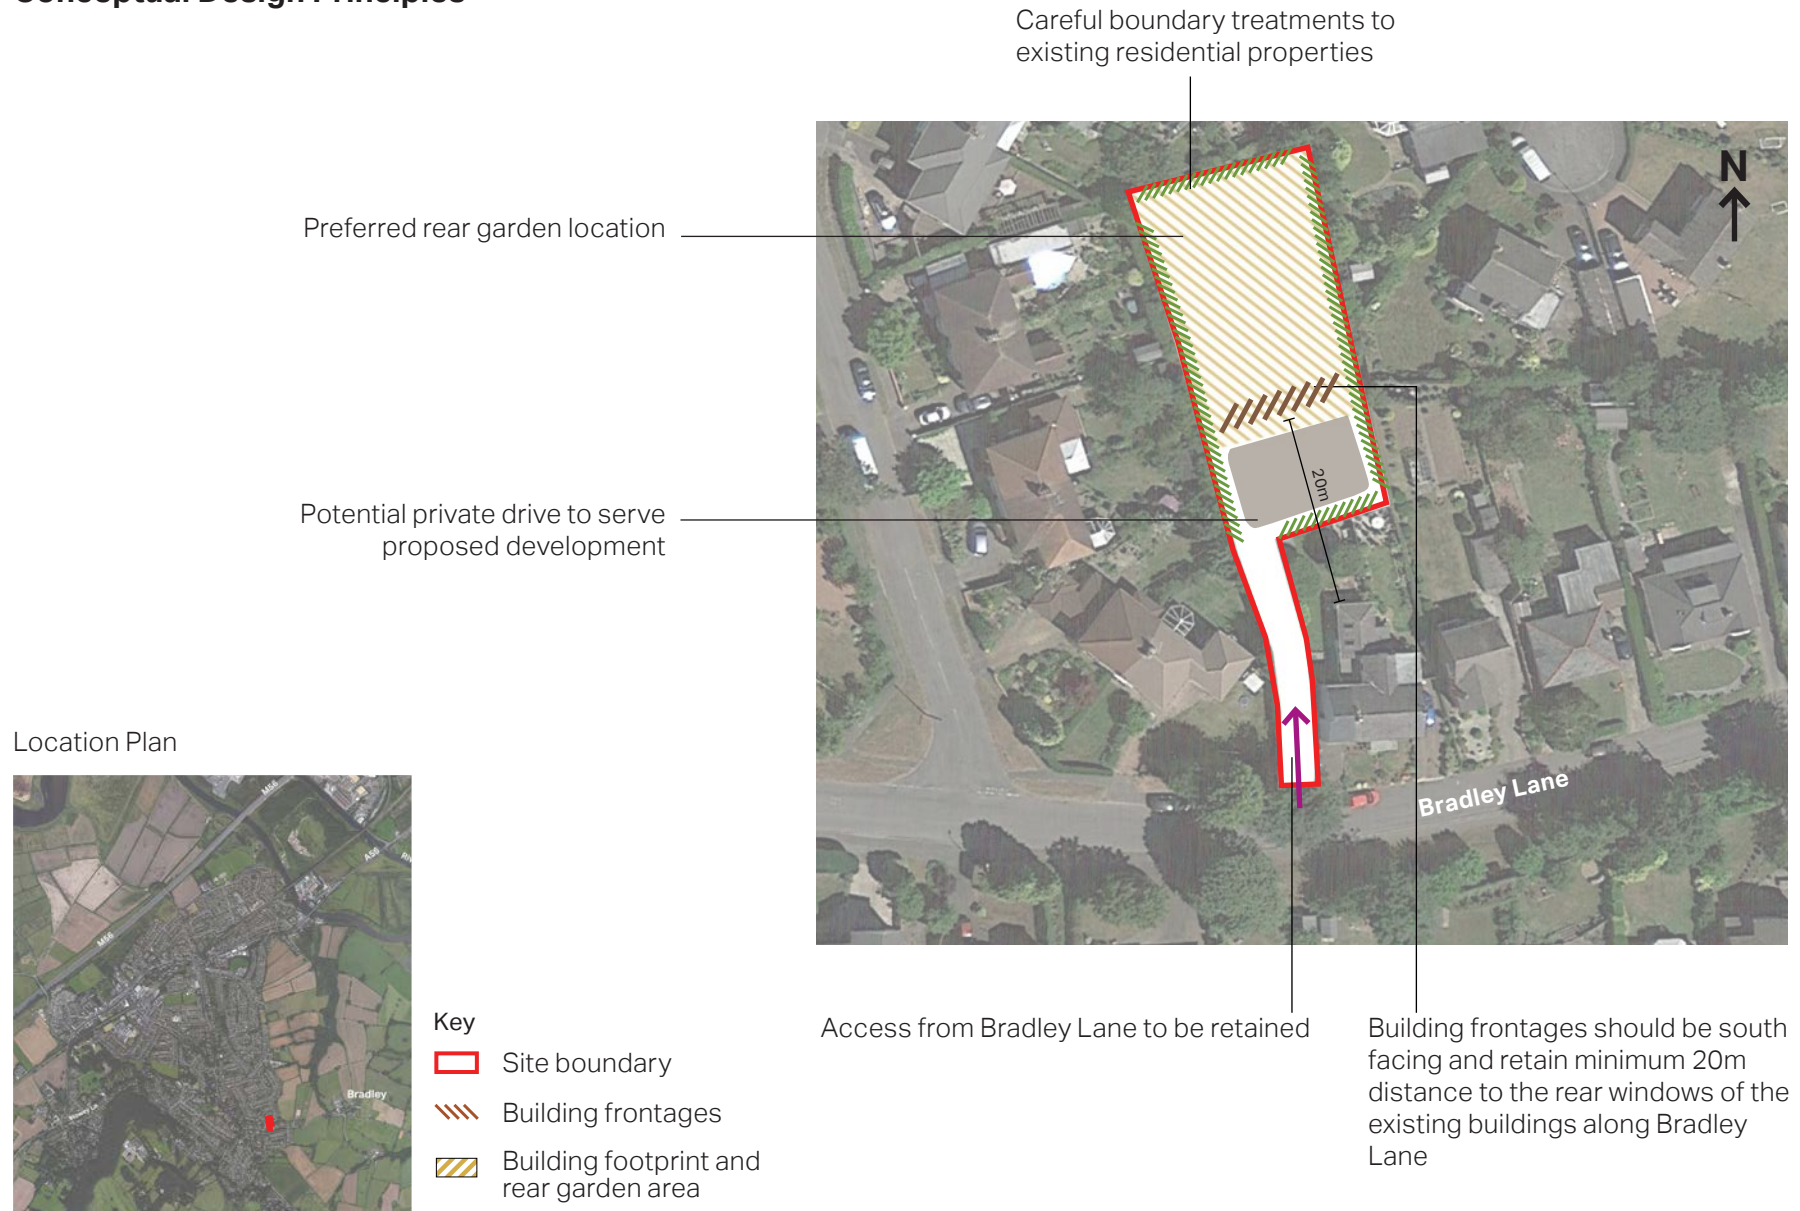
Site FRO/0005 concept masterplan and design principles
